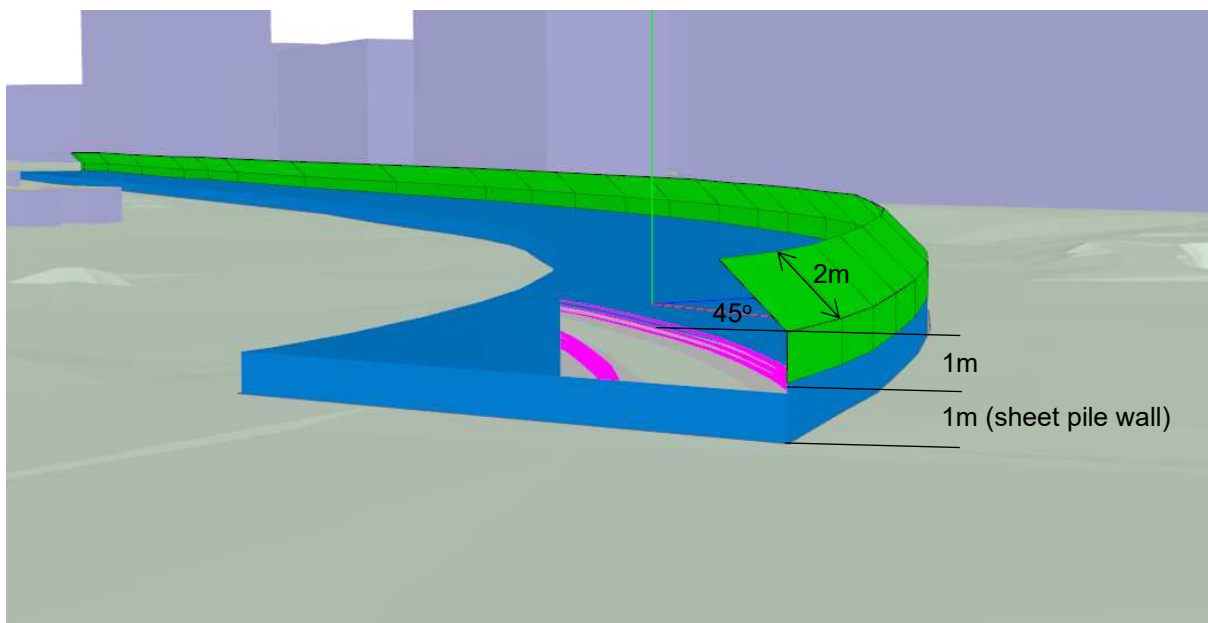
Scenario 3. Sketch of a new barrier with overhang (green shading) installed on top of the existing shielding edge (blue shading).
